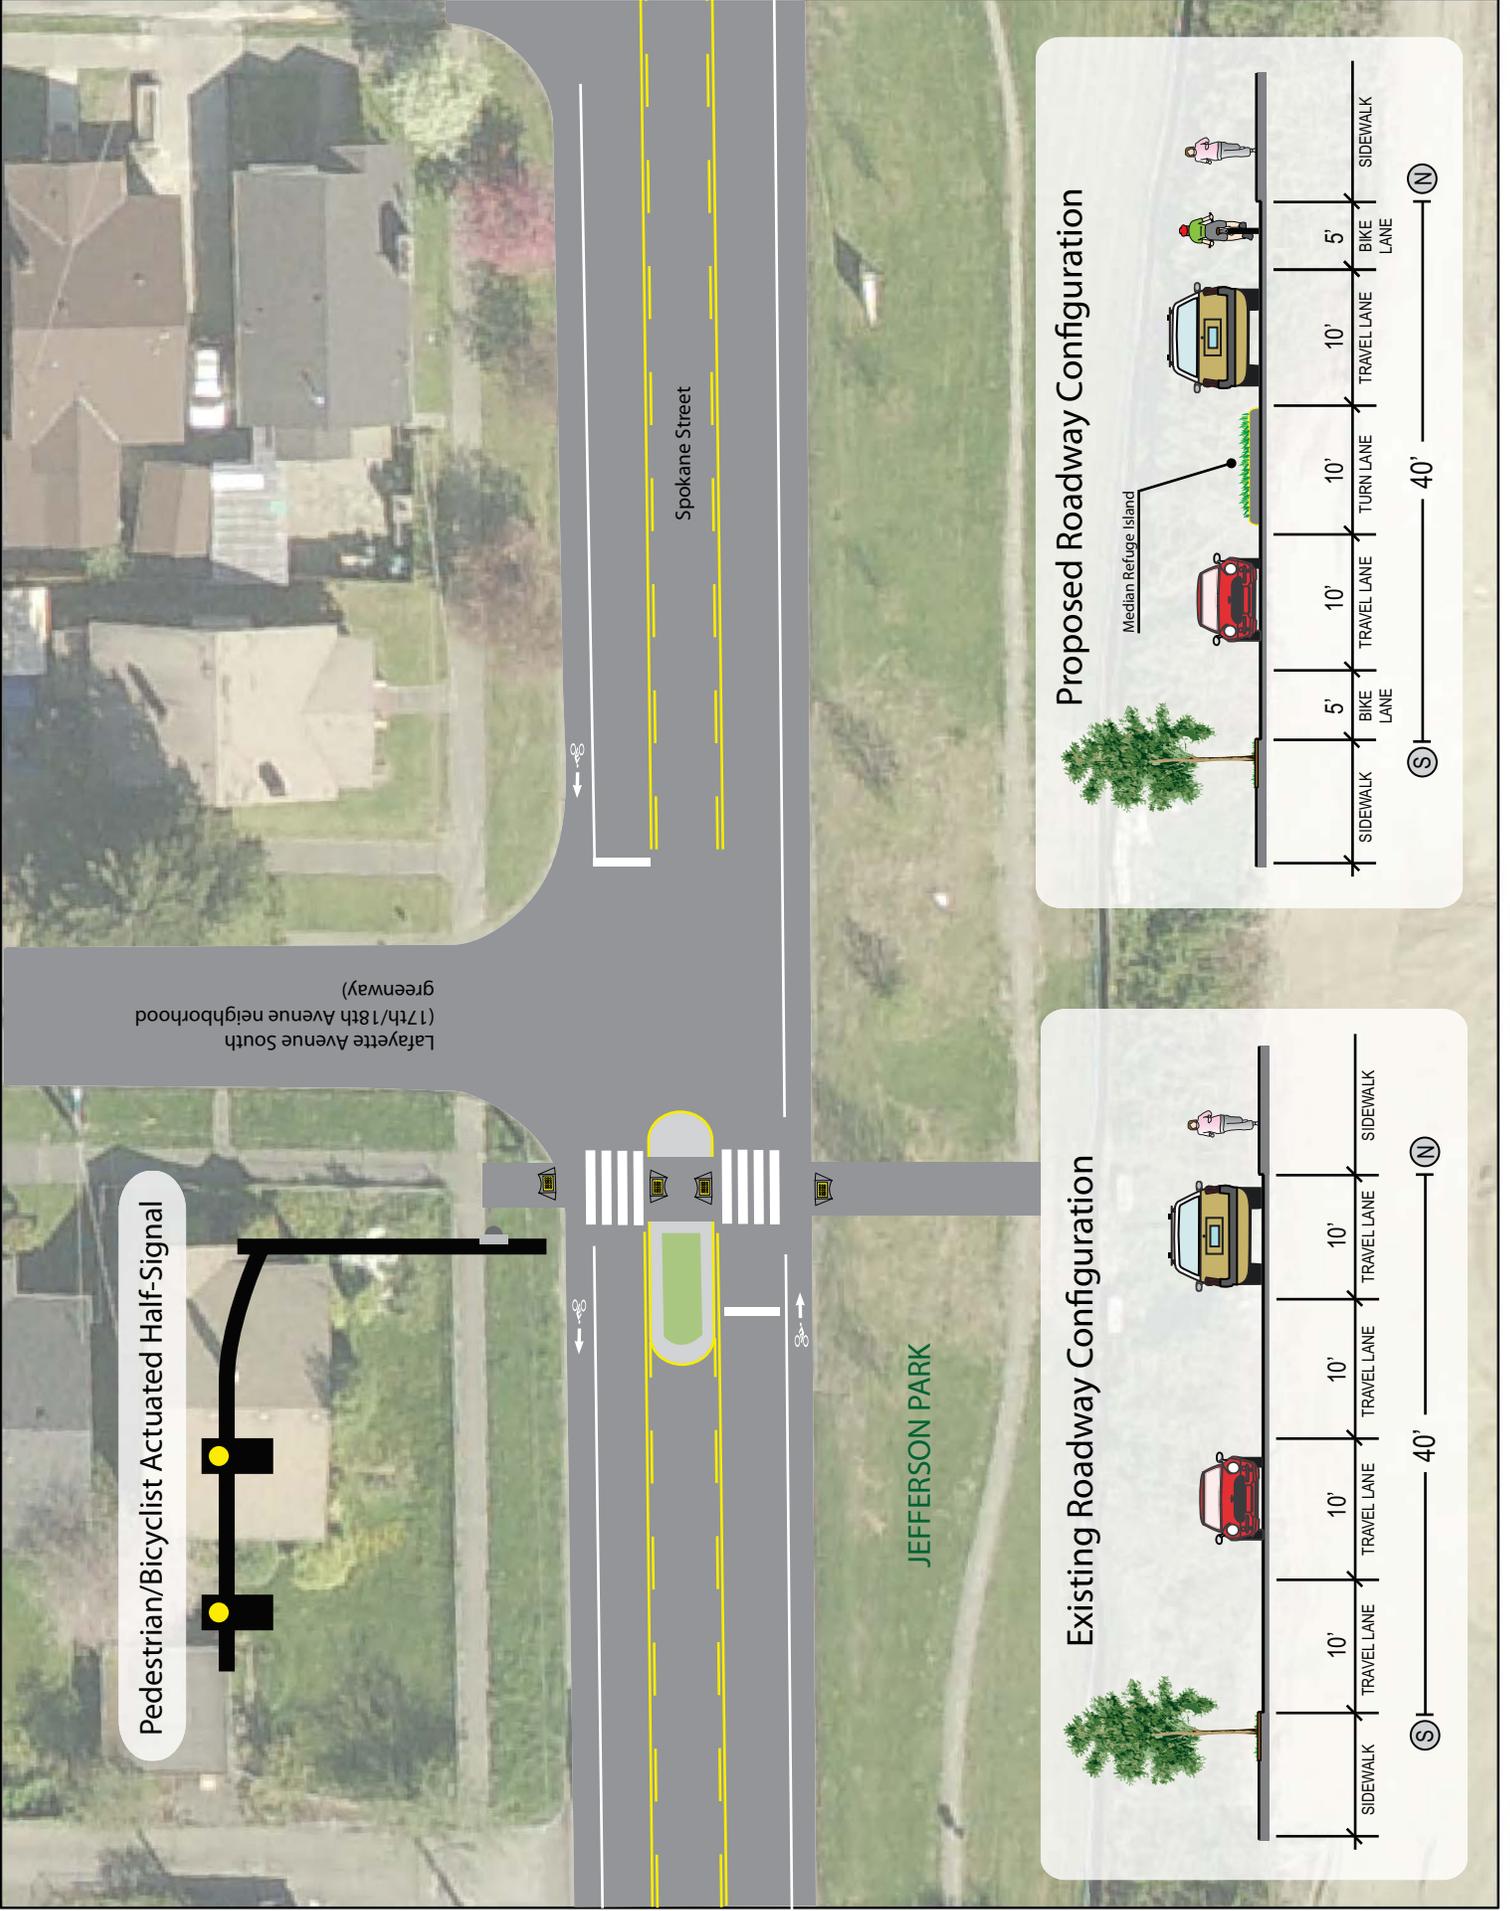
Intersection improvements at Lafayette and South Spokane Street
